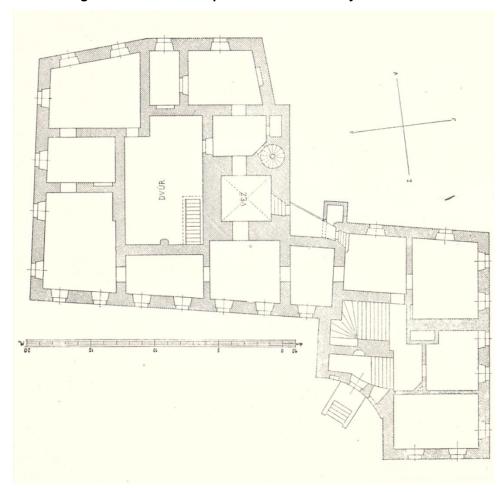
Ground floor plan of the Chateau Lobkovice from 1901. [3]
